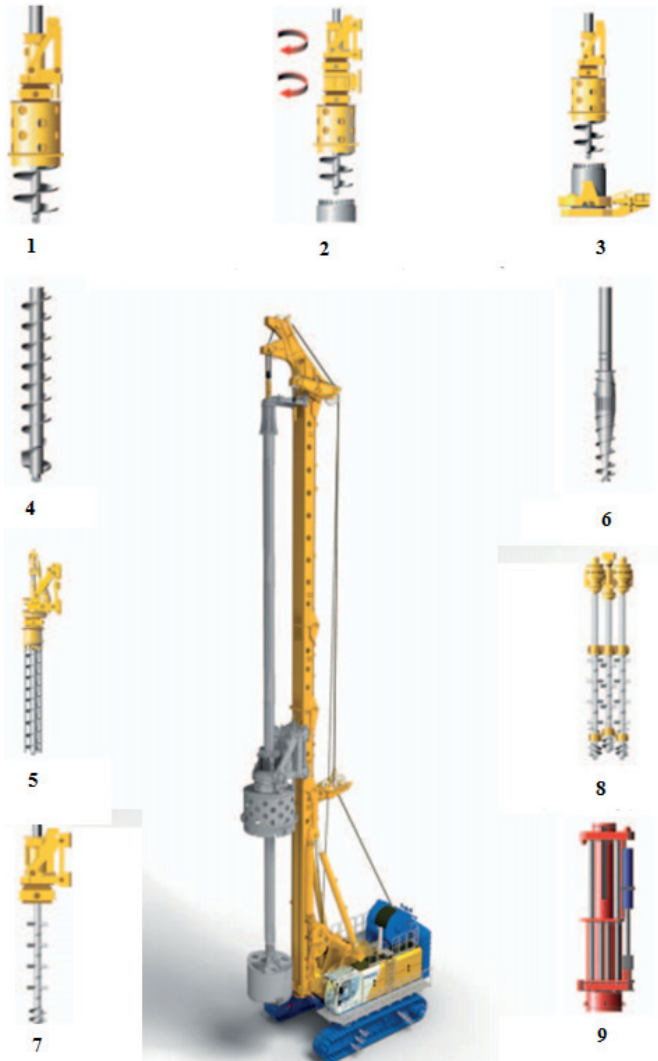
Tools for making piles in various technologies mounted on Bauer pile machine
